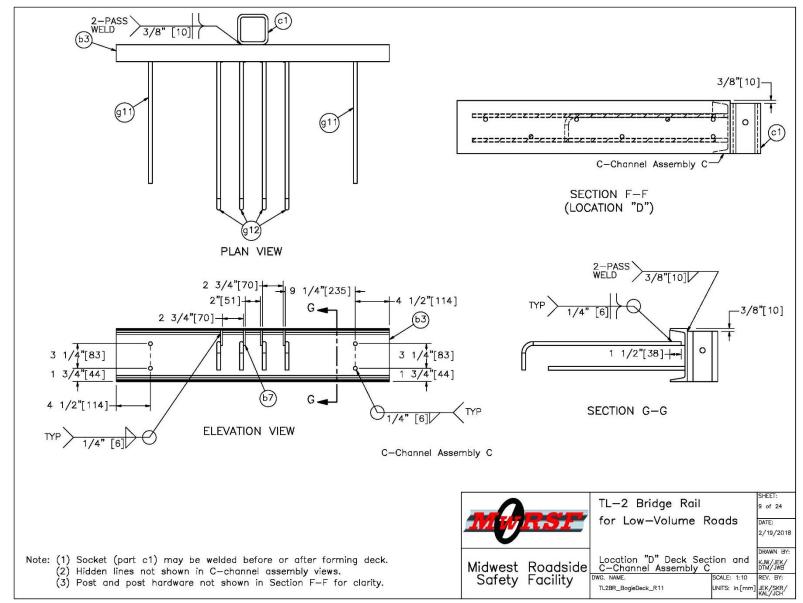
Bogie Testing Matrix and Setup, Location "D" Deck Section and C-Channel Assembly C
